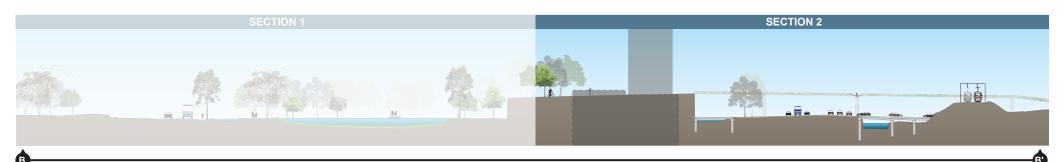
Long-section of the Rozelle Rail Yards - north-south - section 1
